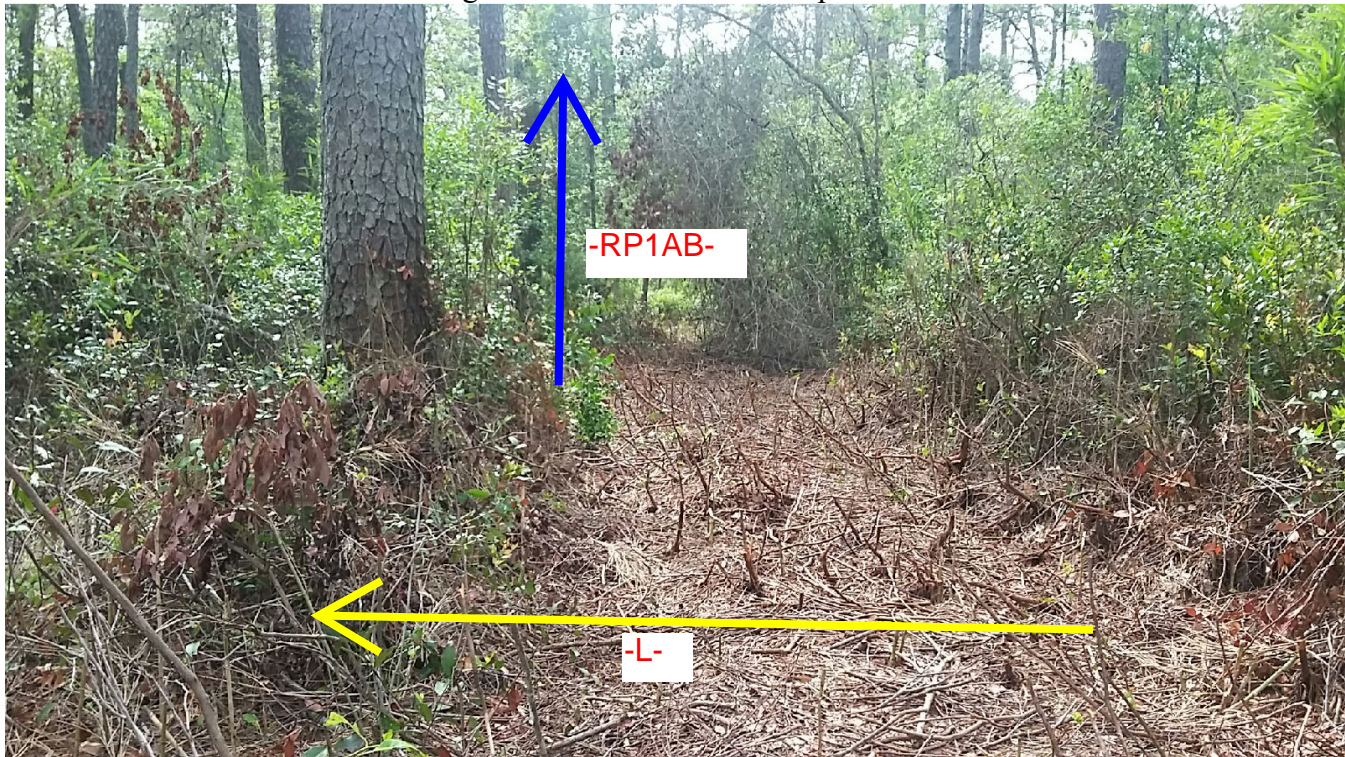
Looking towards End Bent 1 and down station of -RP1AB-
